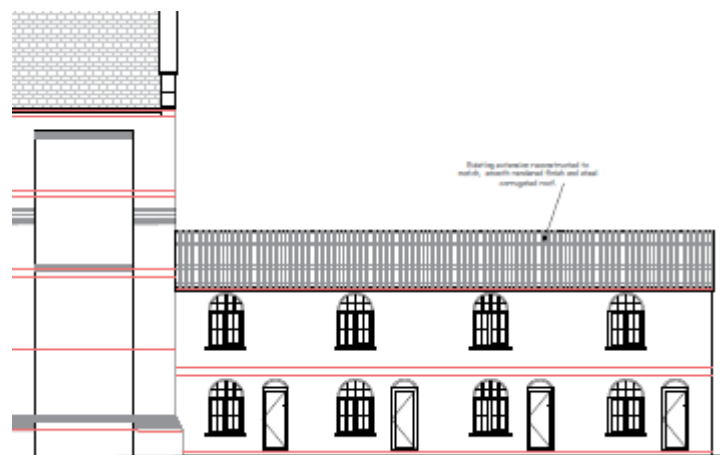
Proposed terrace attached at north end in place of existing steel frame © Milsom Architecture
